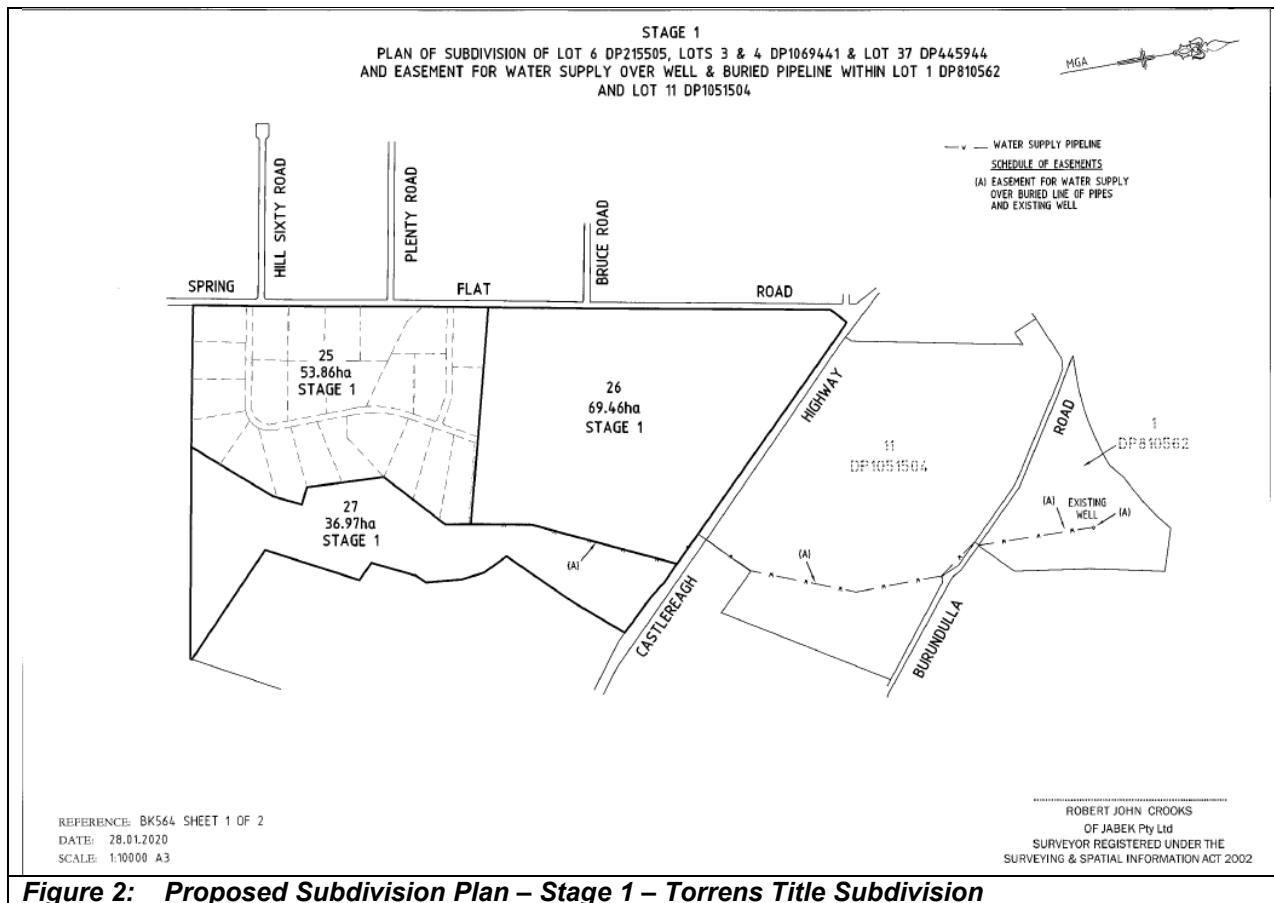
Proposed Subdivision Plan – Stage 1 – Torrens Title Subdivision
